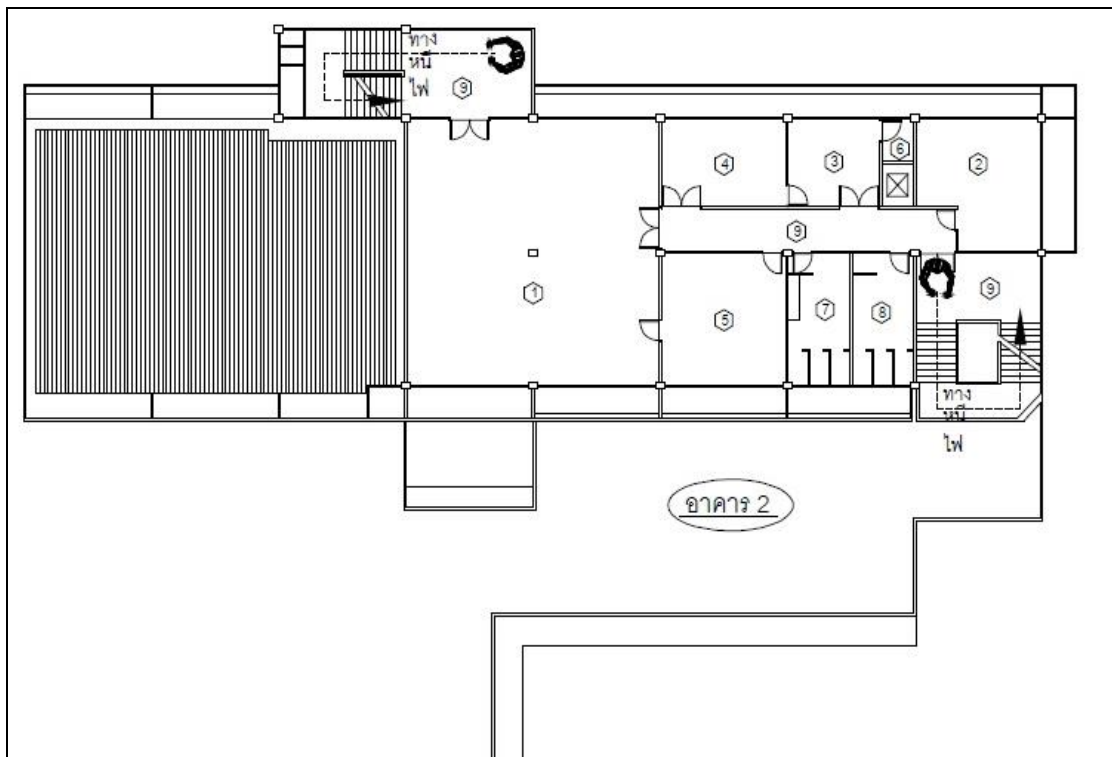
The 3<sup>rd</sup> Floor of President's Office Buildings
